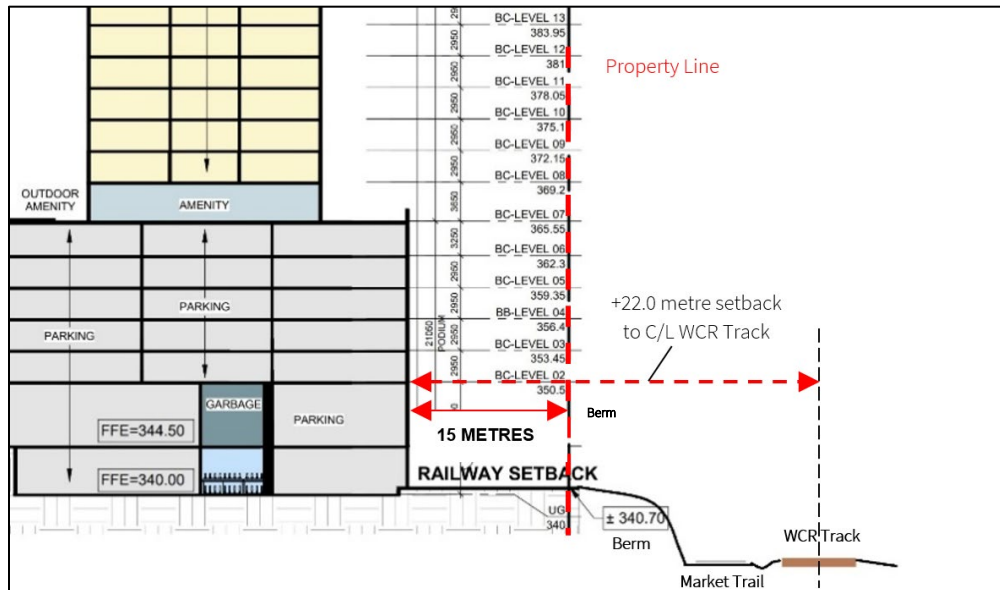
Building C section showing approximate setbacks to the Market Trail and WCR Track. Source: (Excerpt annotated by Hatch) Turner Fleischer Architects Inc. Building Sections DWG No. RZ401 provided 29-Jan-2024.
